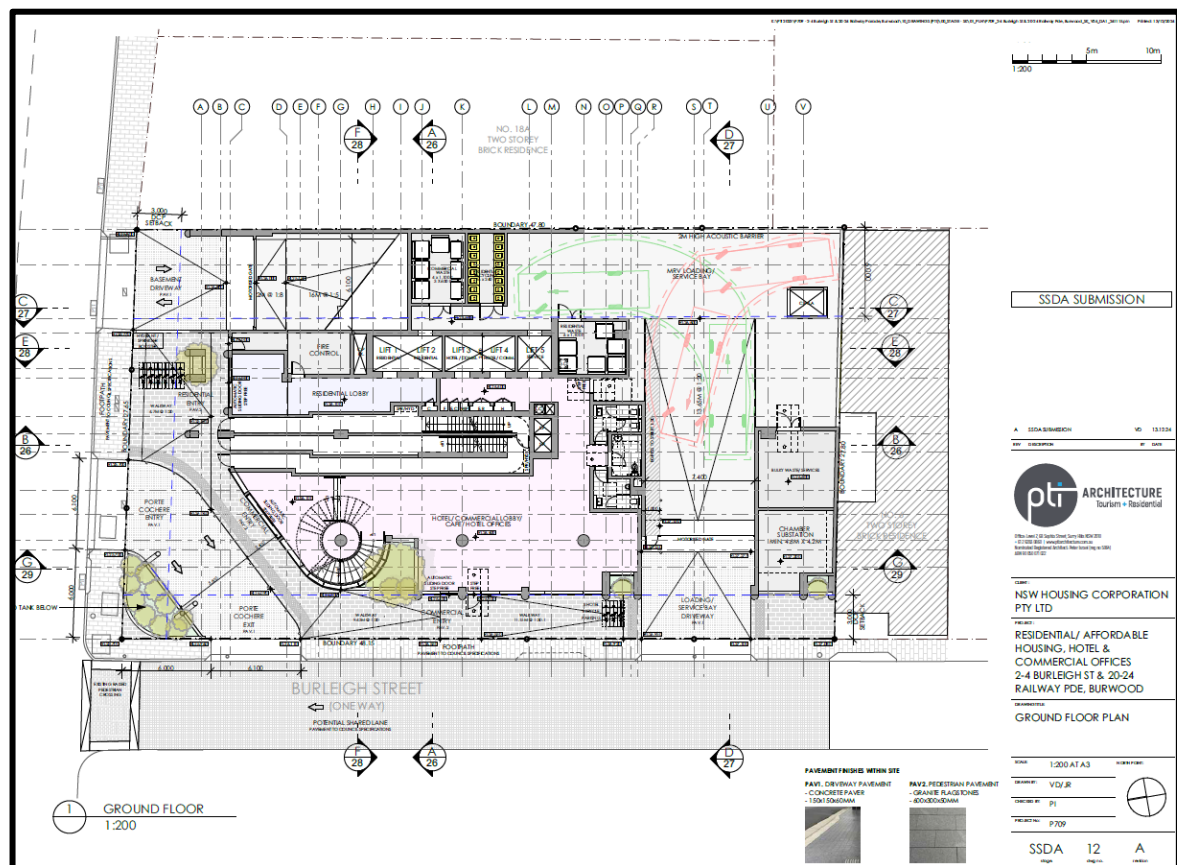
Proposed Ground Floor Plan (Source PTI Architects)
